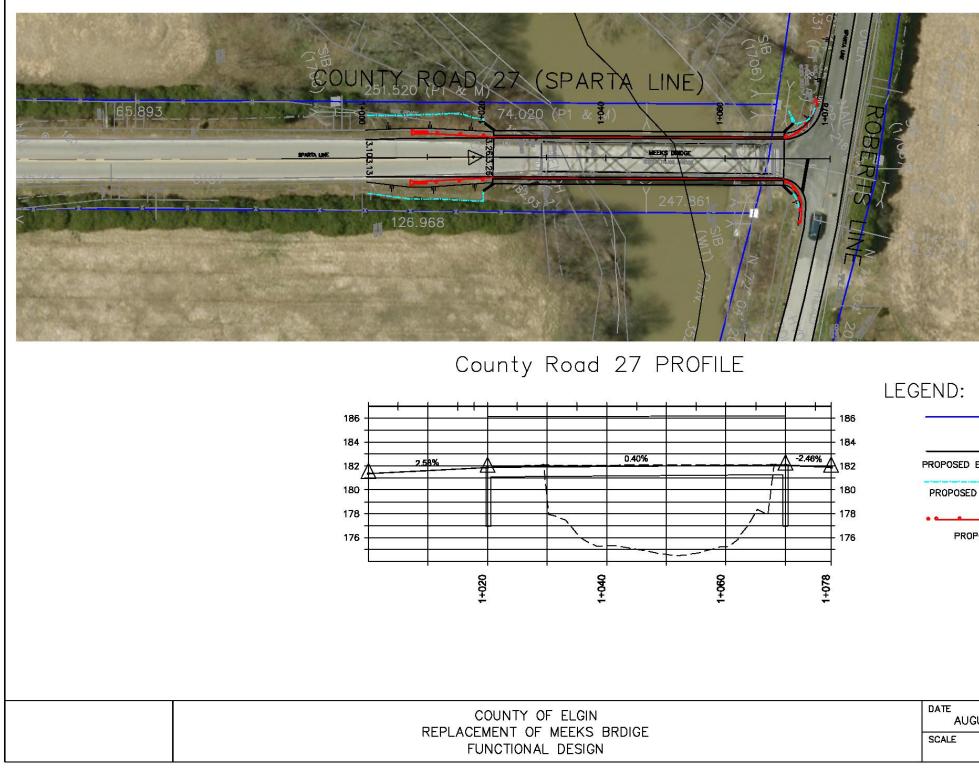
Proposed Replacement Meeks Bridge Functional Design (Provided by CIMA+).
